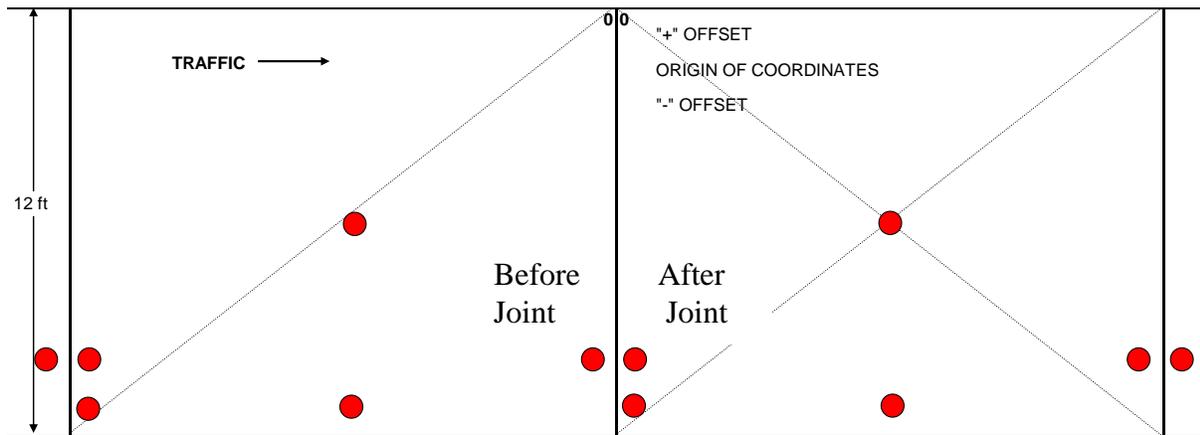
Routine FWD Testing Locations in Test Cell 53-1
